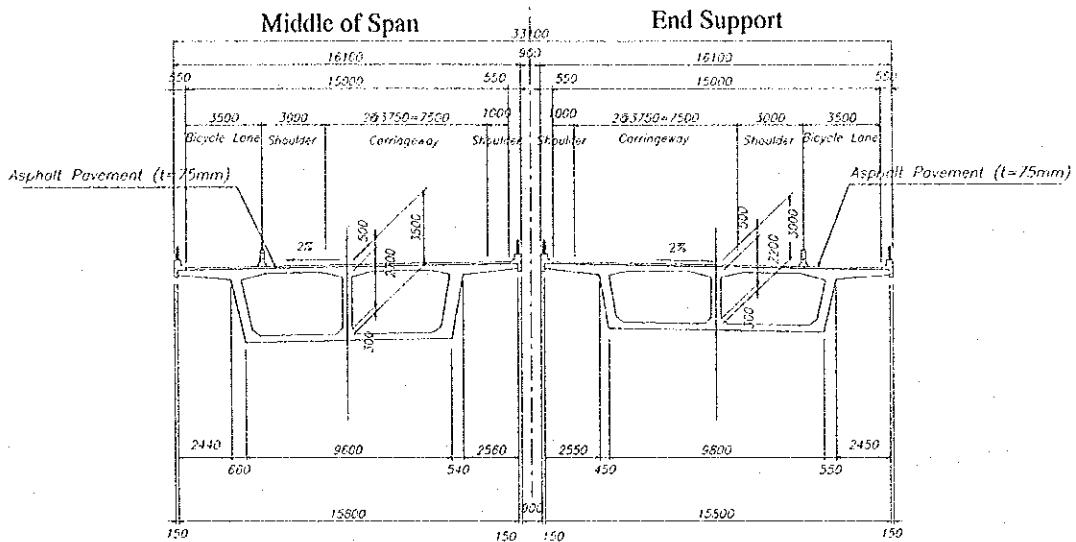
Typical Cross-sections of Superstructure of Main Bridge
